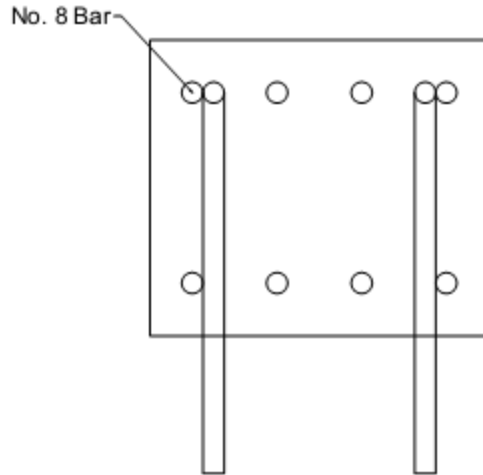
Longitudinal column reinforcement-8 No. 8 bars (distributed across two column faces). Transverse reinforcement not shown.
